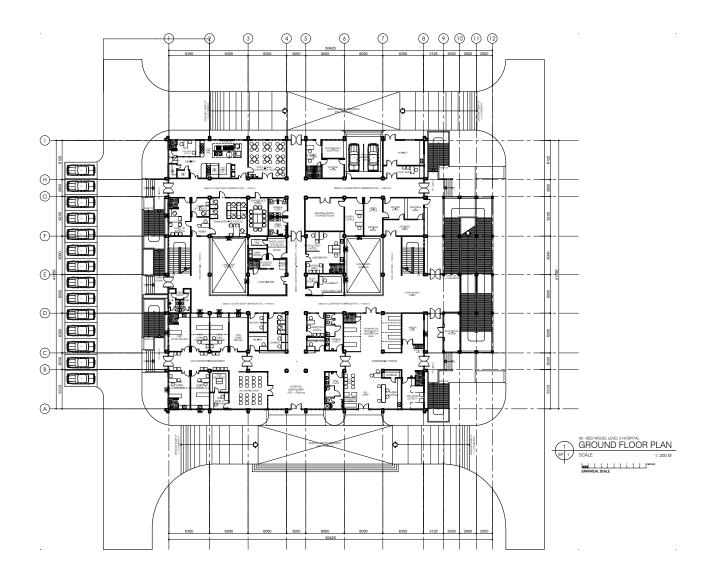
Two-Storey, 50-Bed Hospital Level One: Ground Floor Plan
